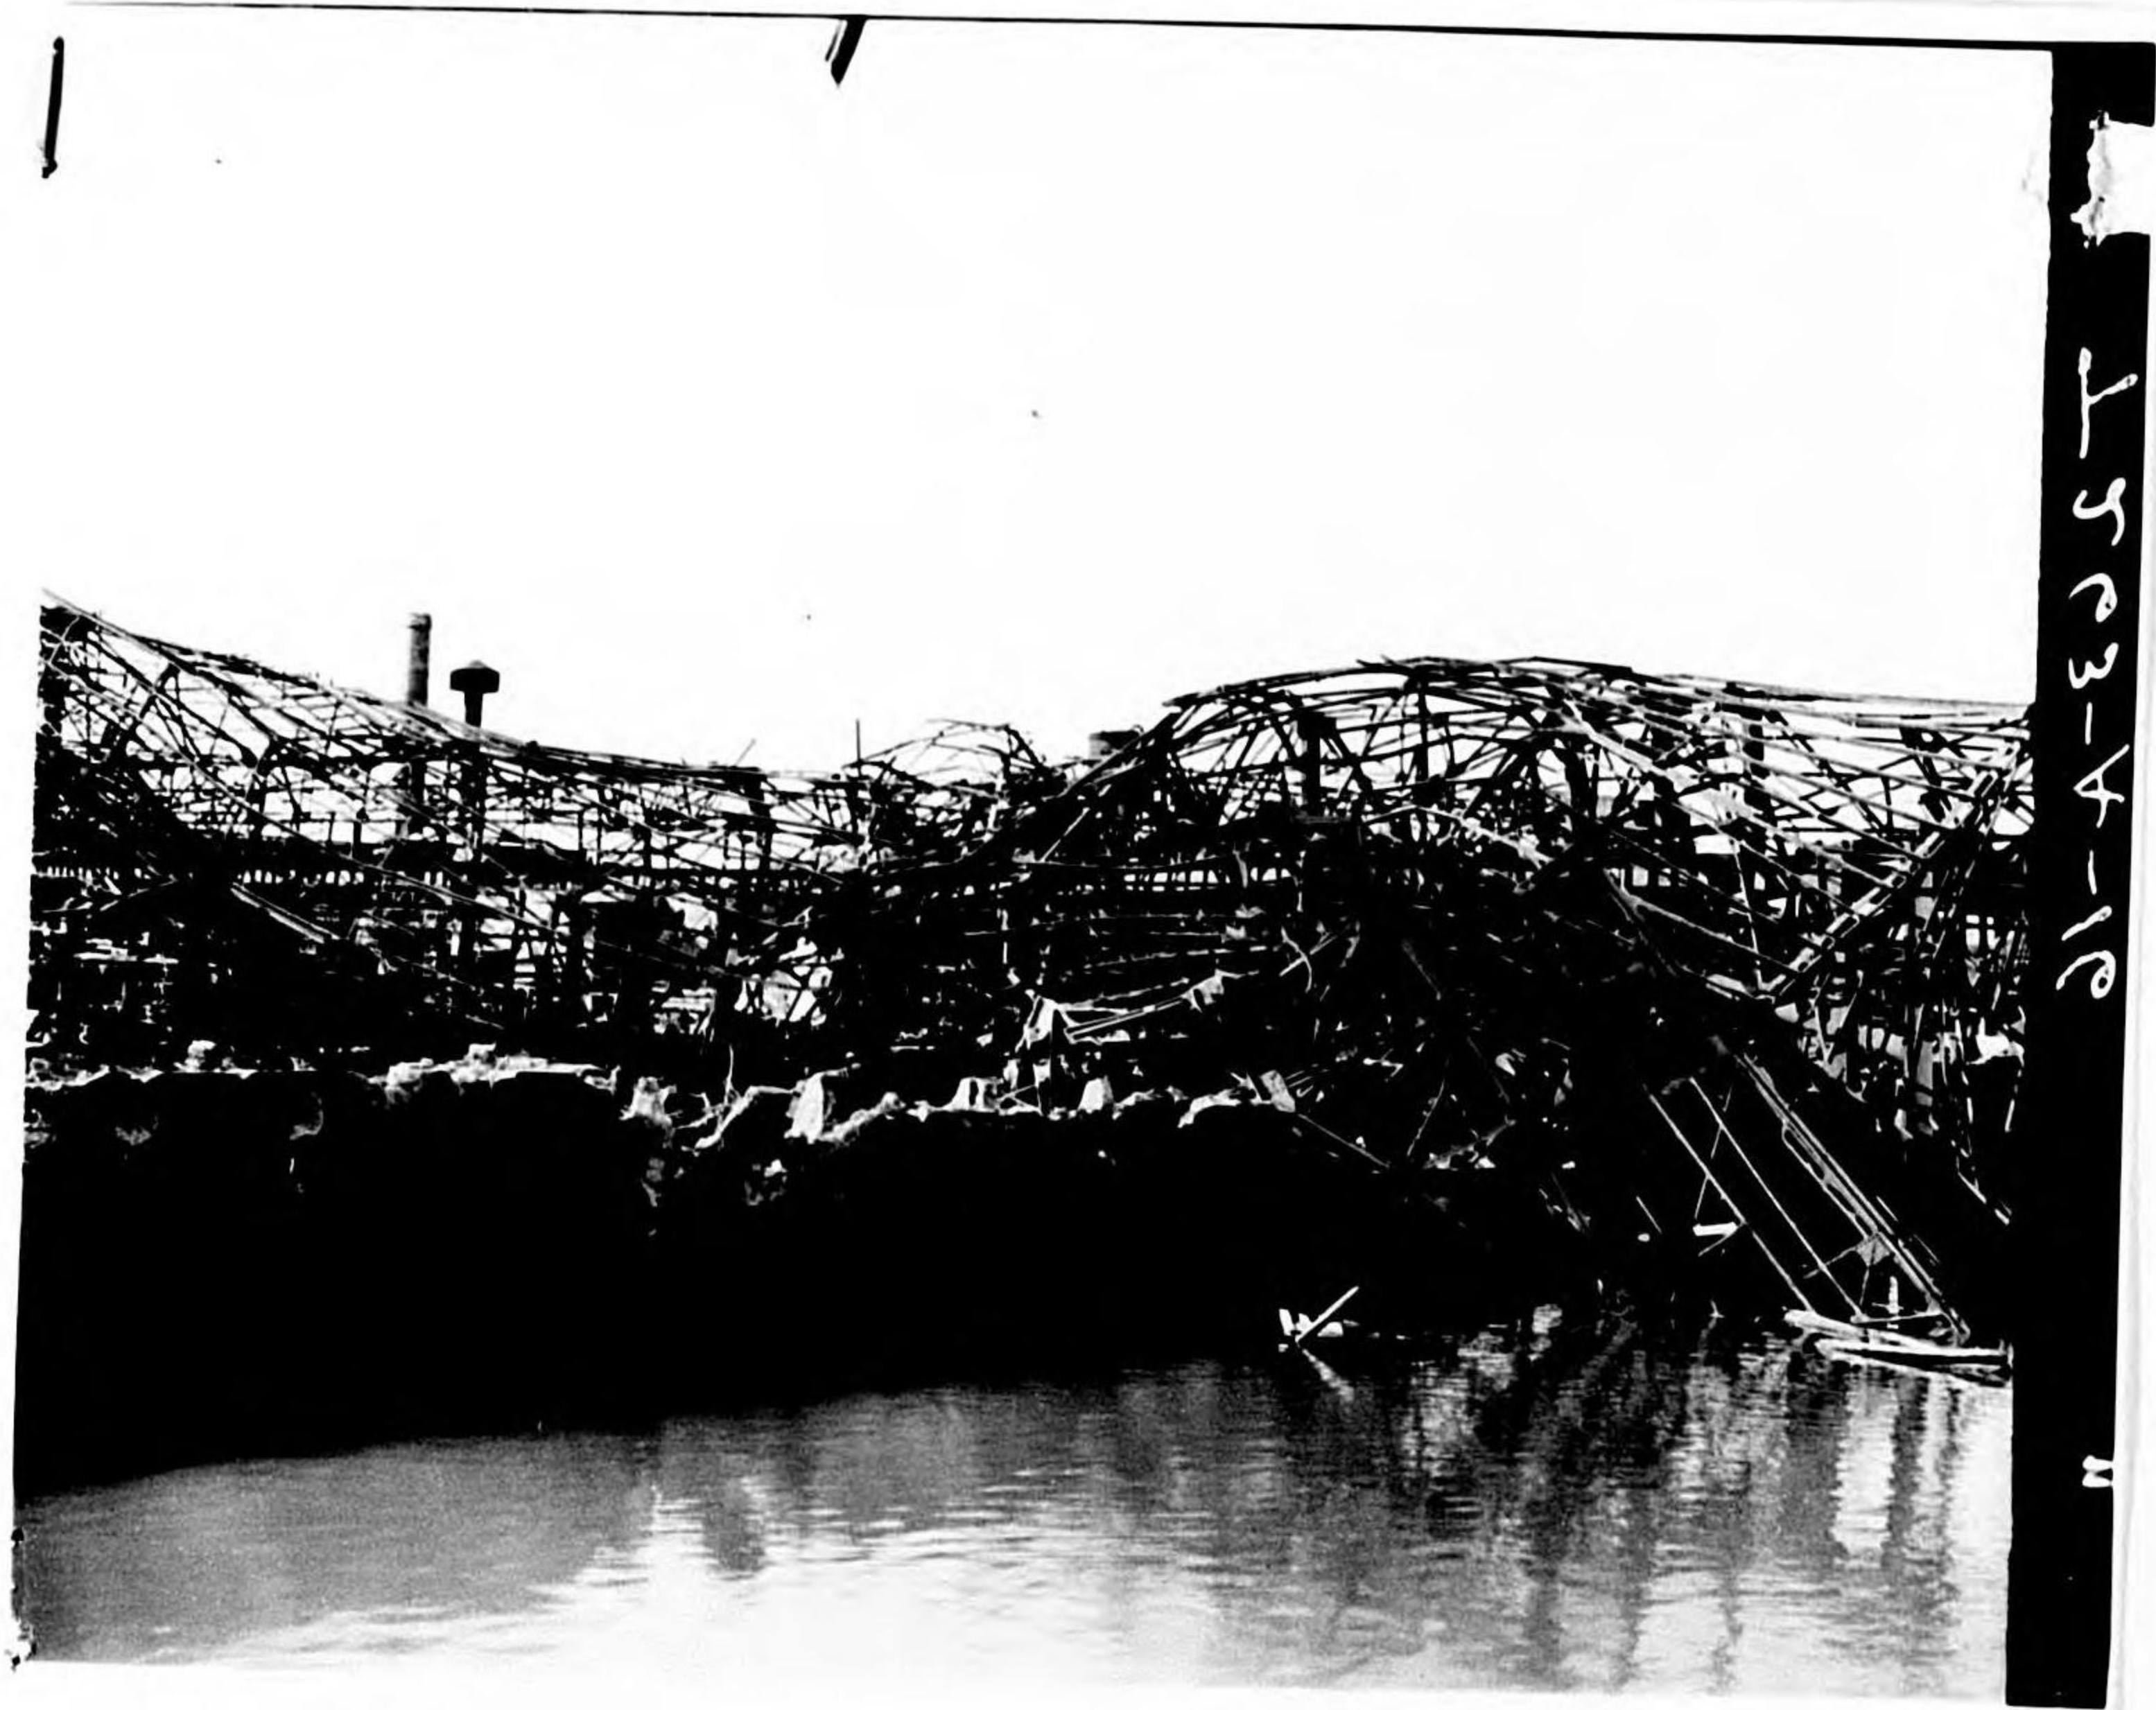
Bldg. 9. Bomb 46. Collapsed cantilever.
